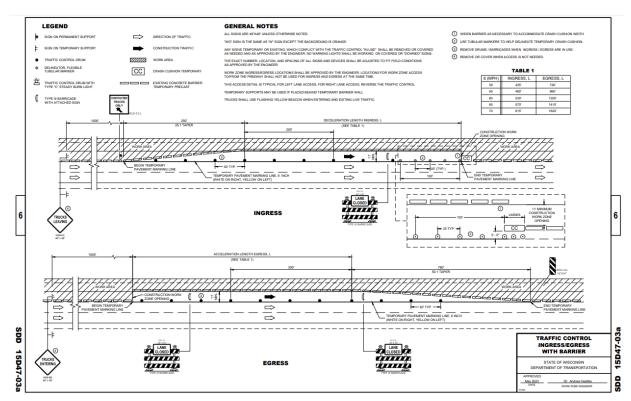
WisDOT Construction Access Point Drawing SDD 15D47-03a (45).
